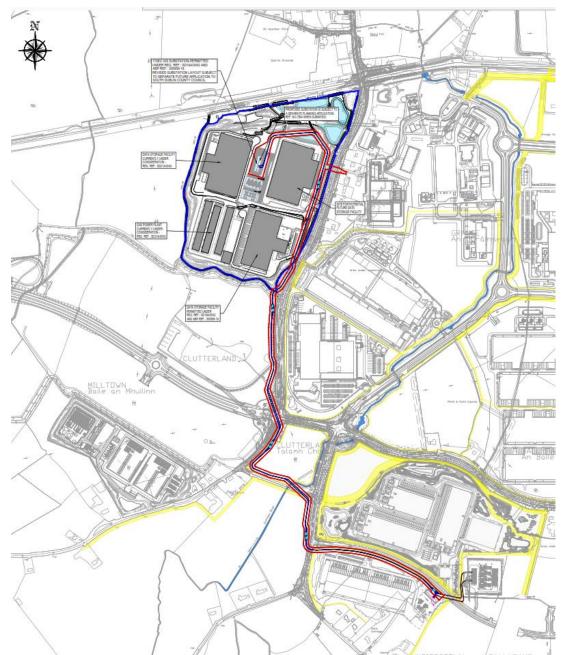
Extract from CSEA Consulting Engineers Overall Route Layout Plan
